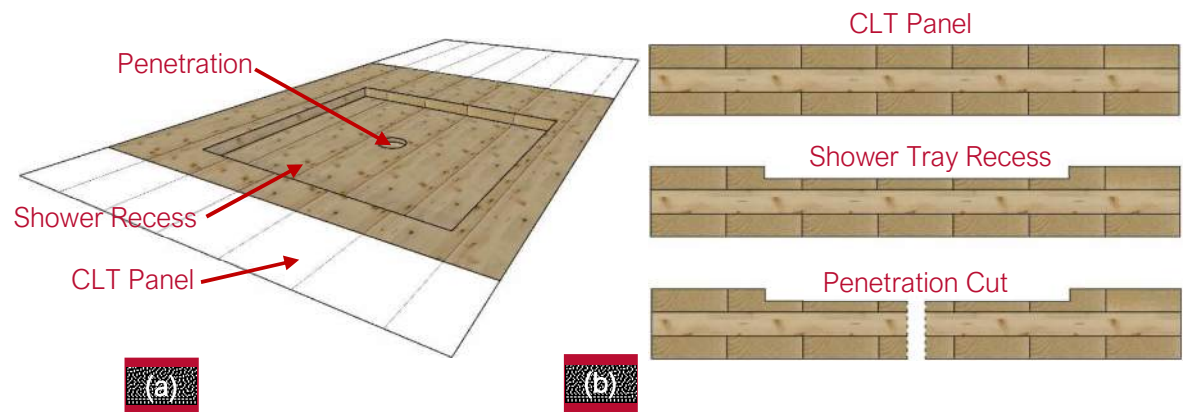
Shower tray and chasing through the Red Stag CLT panel; a) Shower recess in the CLT panel and penetration cut through CLT panel; b) Step by step shower tray CNC process.
